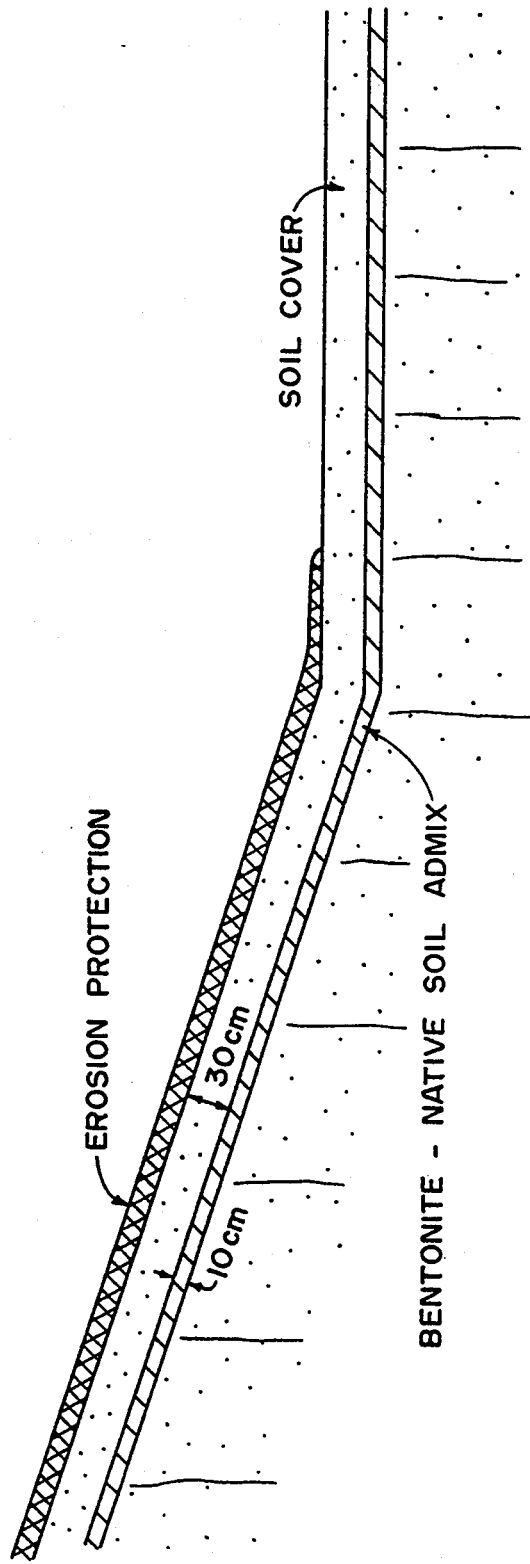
SCHEMATIC CROSS - SECTION OF BENTONITE ADMIX LINER
